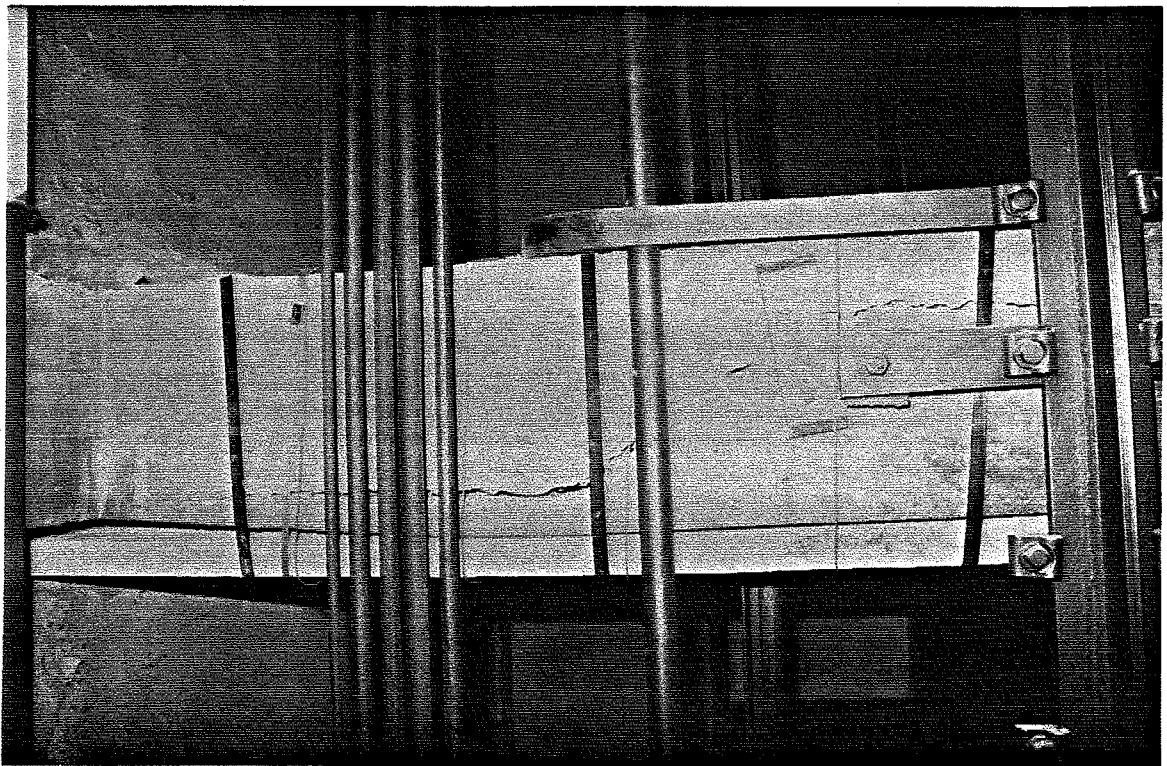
Photograph showing shear failure of reinforced concrete beam, counterweight guide support bracket and temporary repairs to beam.
